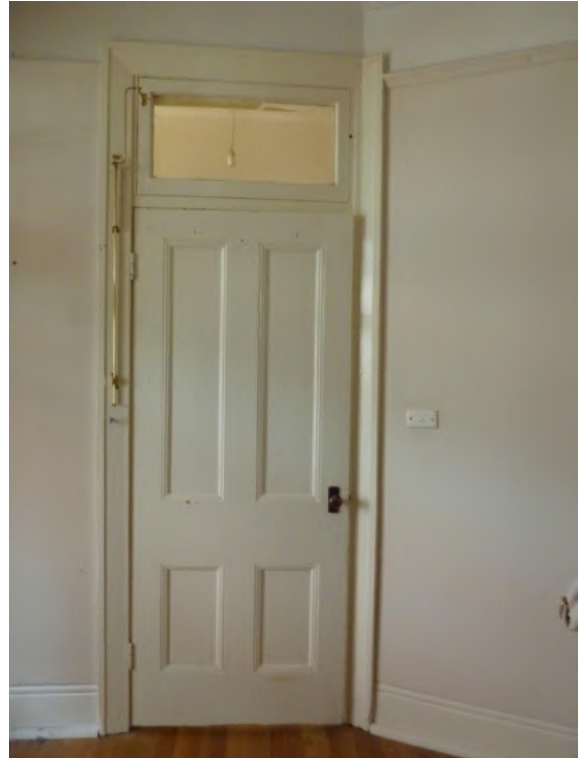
A typical four-panel internal door with central pivot fanlight, reproduction brass fanlight mechanism, and timber architrave (first floor level, Flat 56B). (Source: GML 2015)
